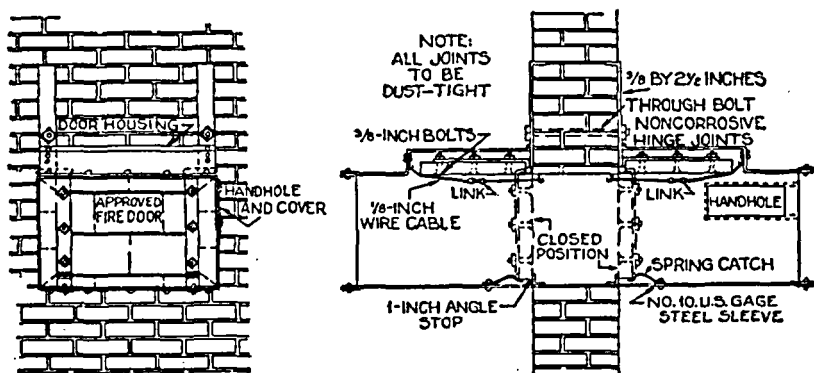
Suggested type of automatic hinged fire door for duct passing through opening in fire wall.
